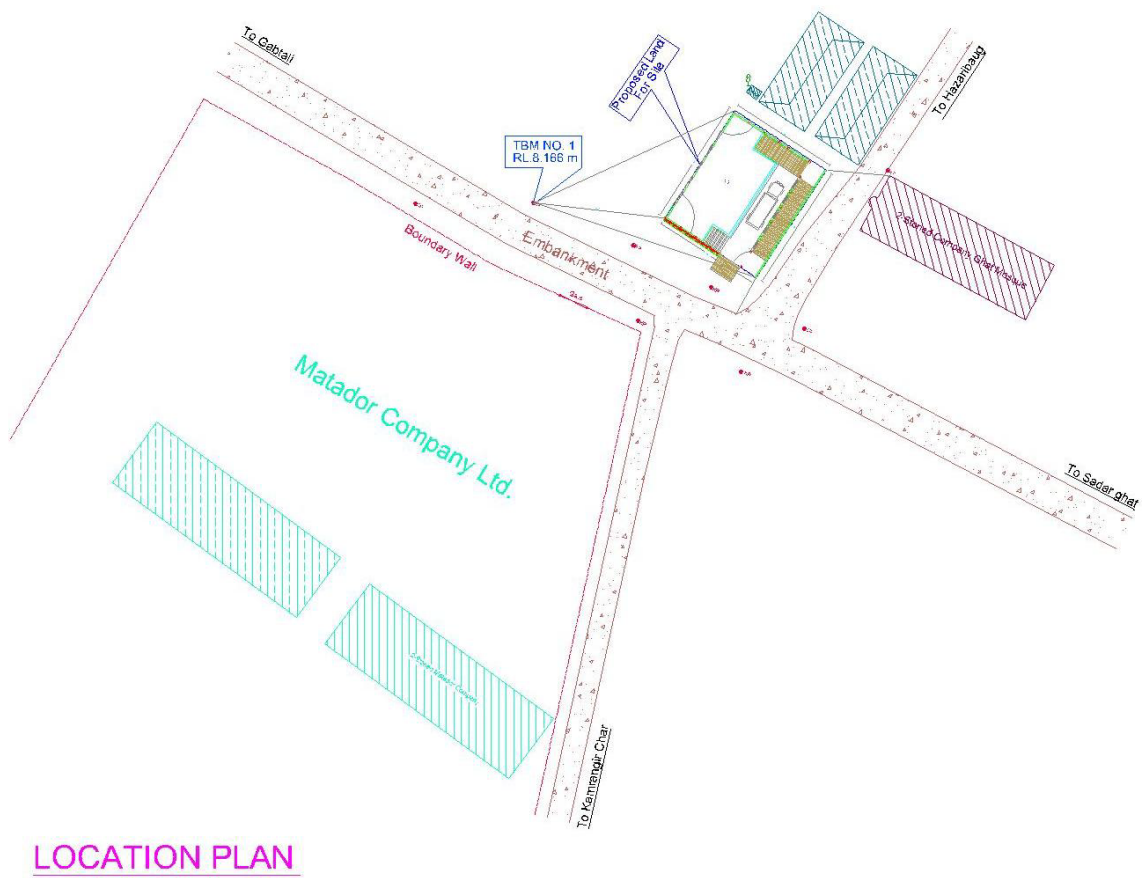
STS – 8 Berry Bandh Hazaribag Matador Layout Plan (23°43'39"N, 90°22'2"E)
